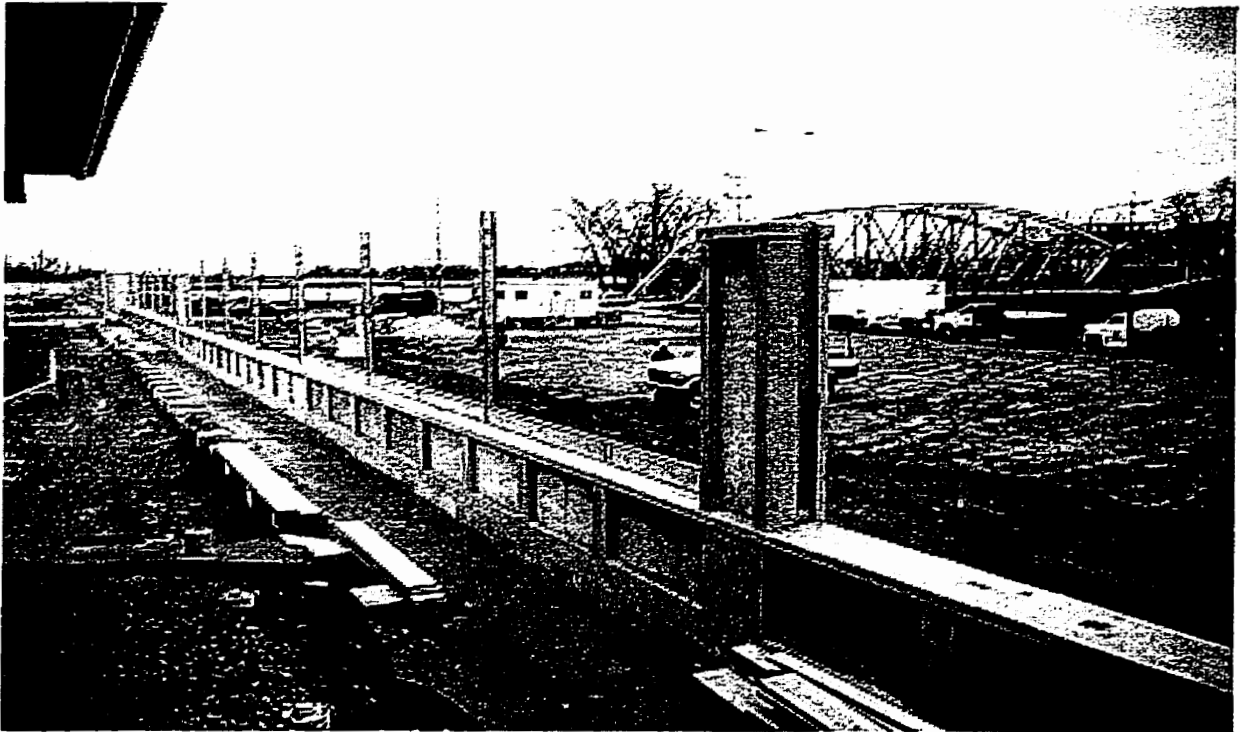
Floodwall construction in Grand Forks, North Dakota Source: Flood Control of America
